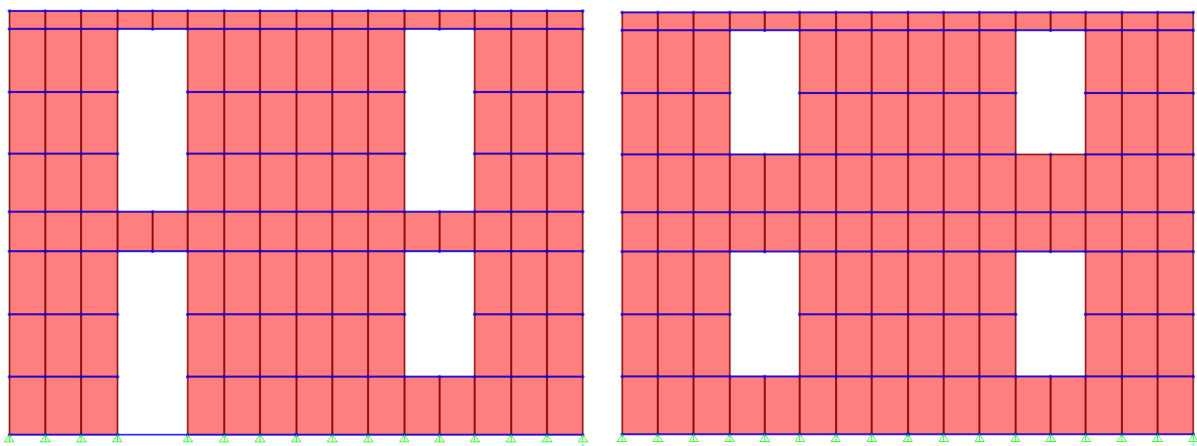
House WPL model elevation view, along X axis: Door wall (left), Window wall (right)
